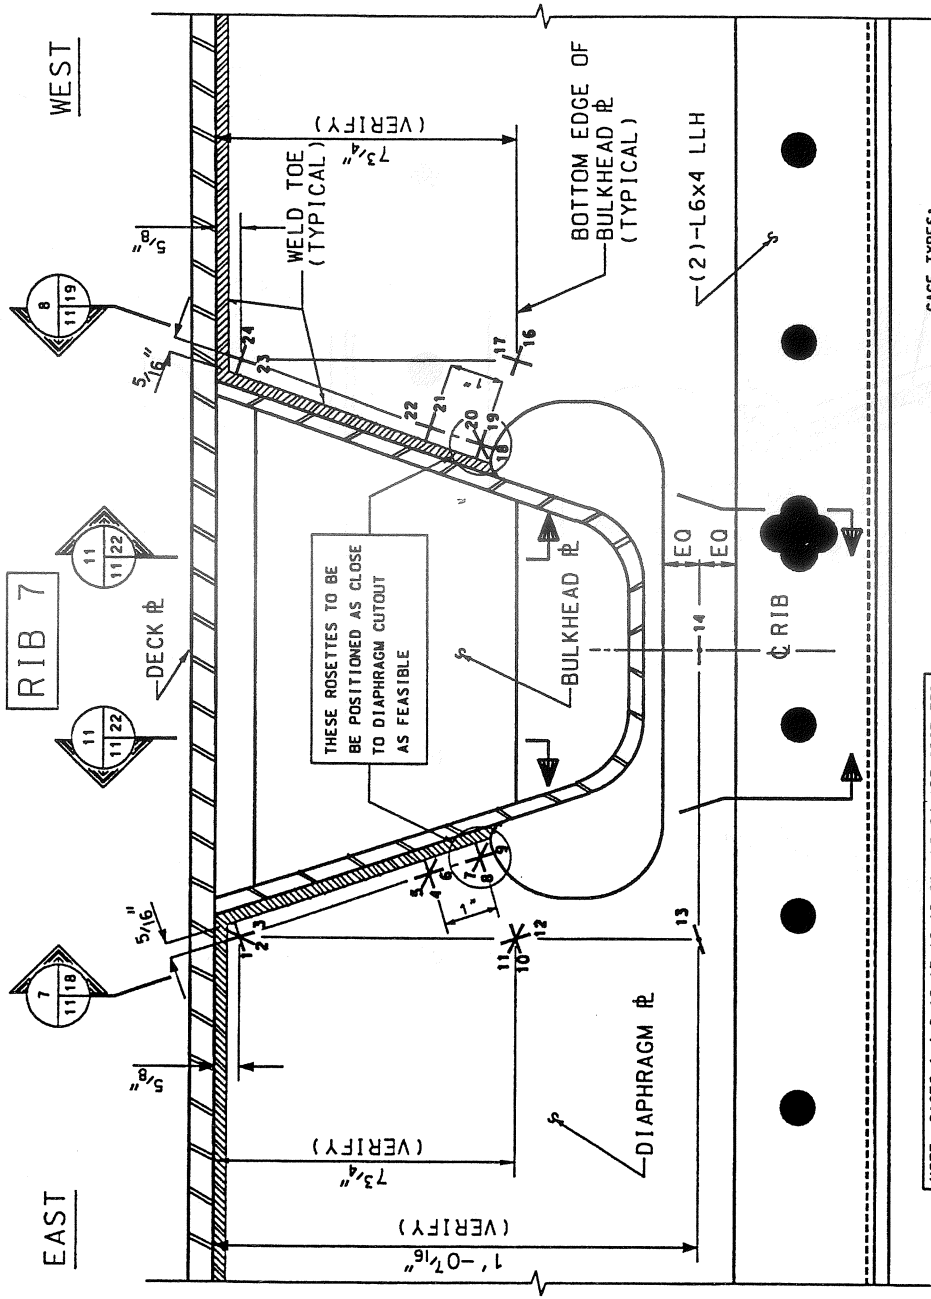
DETAIL - PARTIAL NORTH ELEVATION OF DIAPHRAGM OVER FLOORBEAM "B"
